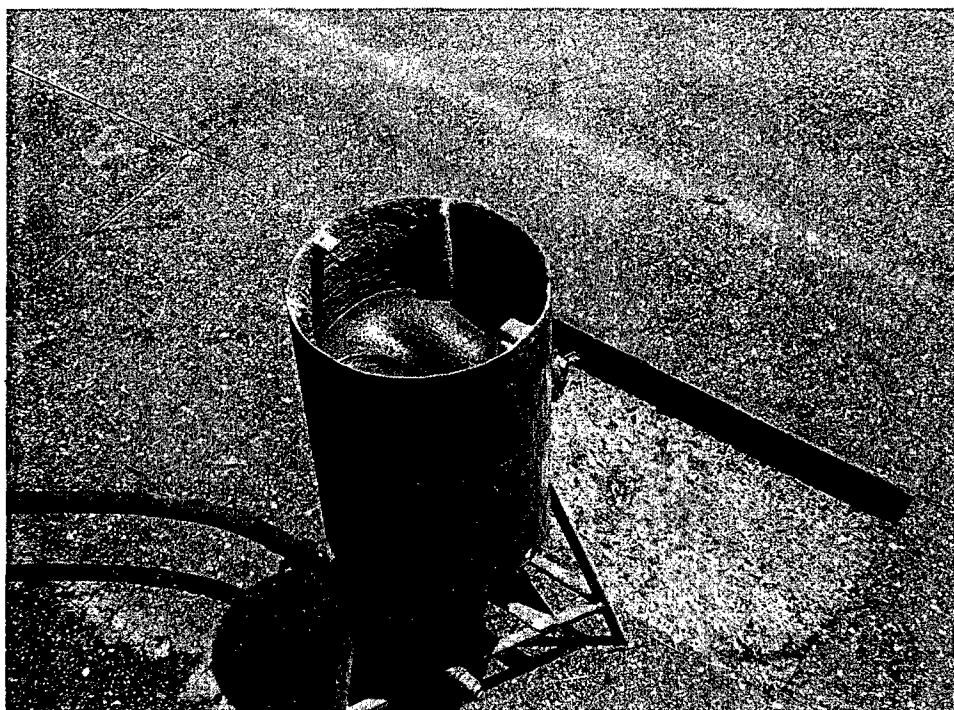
Air-driven paddle mixer, used with PaveMend 15
